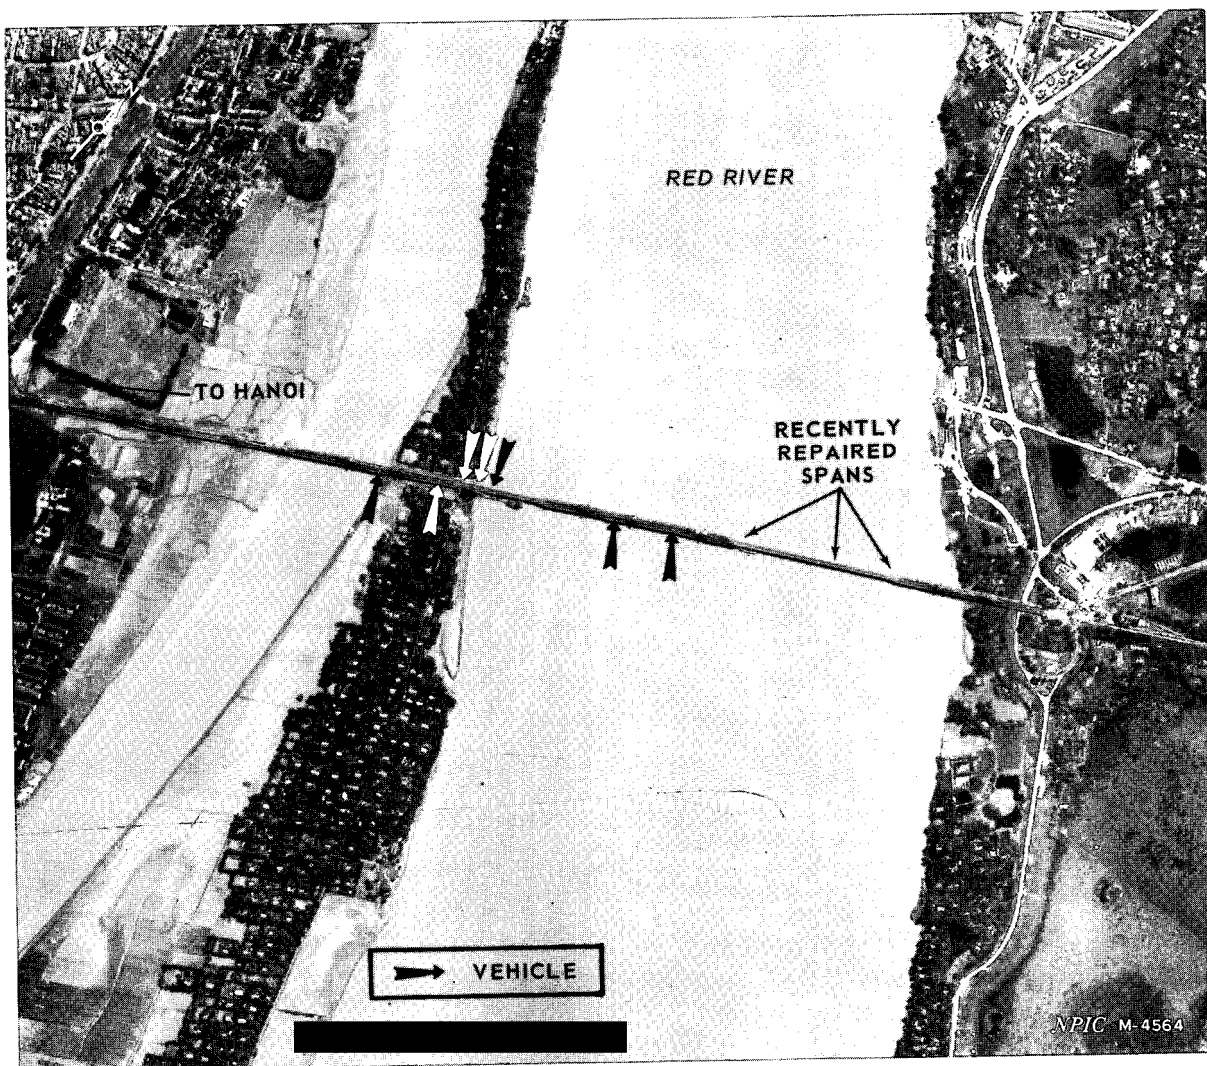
PAUL DOUMER RAILROAD/HIGHWAY BRIDGE.
